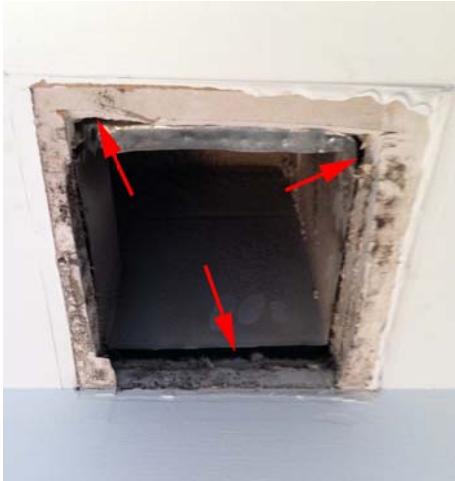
Gaps between exhaust ductwork and surface mounted grilles (removed in this photograph)
